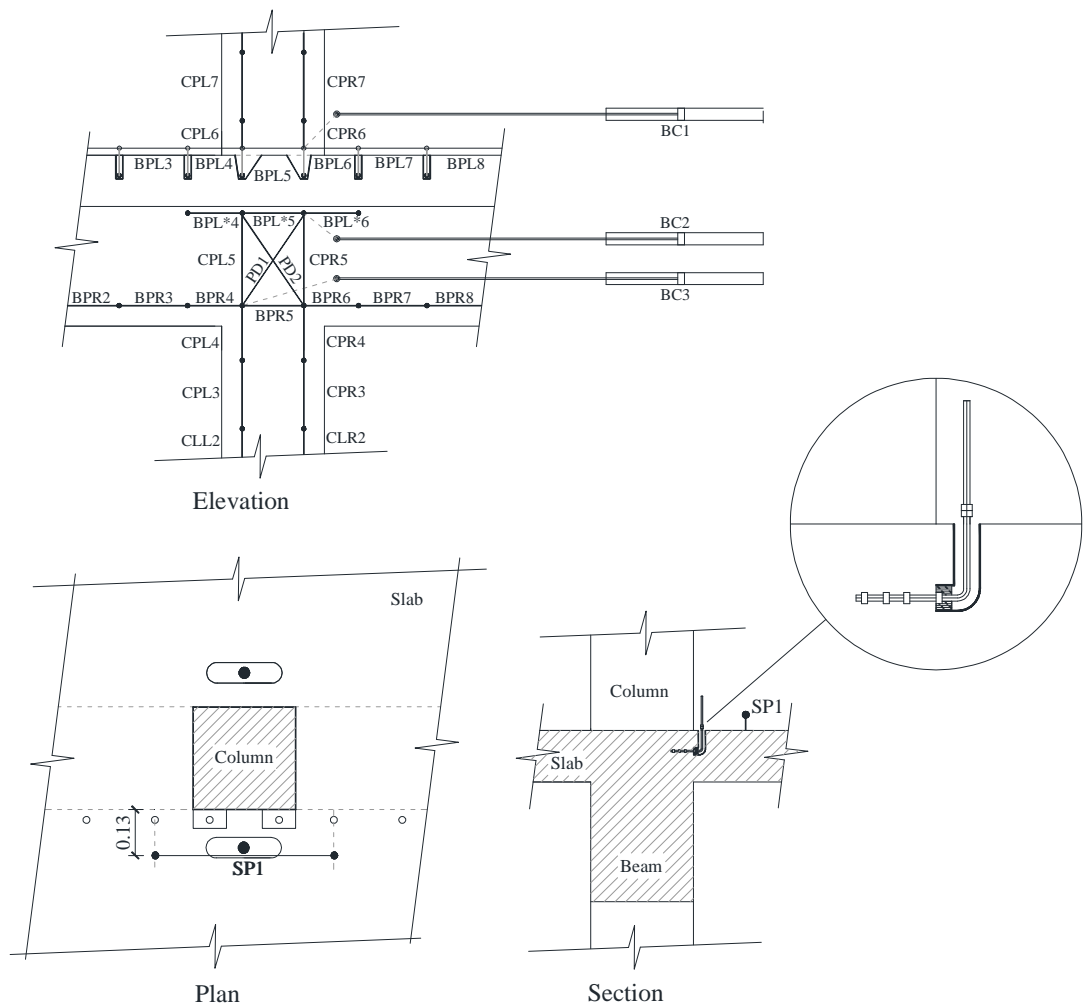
A general layout of the instrumentation that measures the deformation of internal beam-column specimen J4-X.
